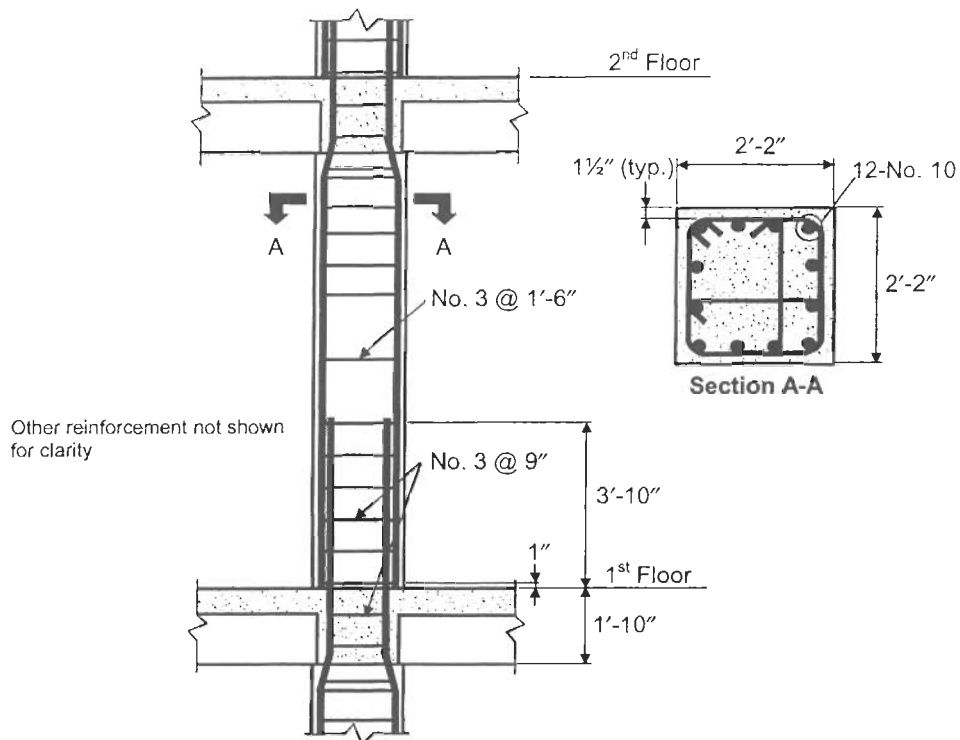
Reinforcement Details for Column C4 Supporting the 2<sup>nd</sup> Floor Level (SDC C)
